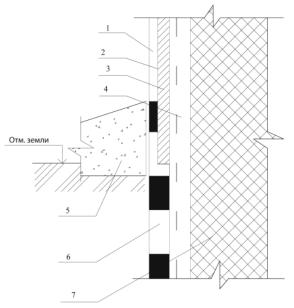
Schematic diagram of adjacent of polymer cement waterproofing with bitumen polymer layer at ground level
